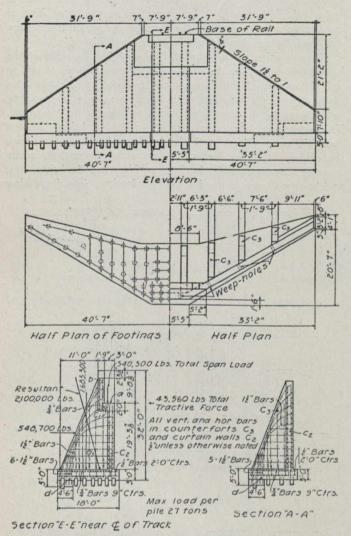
Type C<sub>1</sub>; Reinforced Concrete Counterfort Abutment.
